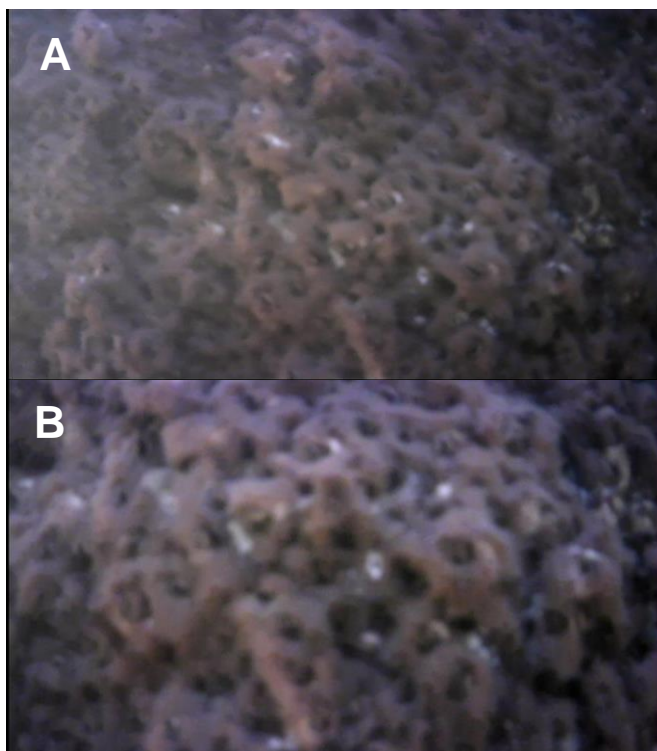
Underwater Images of Concrete Piles in US-301 Bridge over Alafia River (Site 4).
